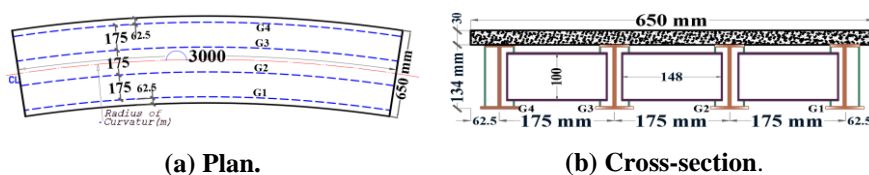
S175 Bridge model dimensions (Geometry and dimensions).
